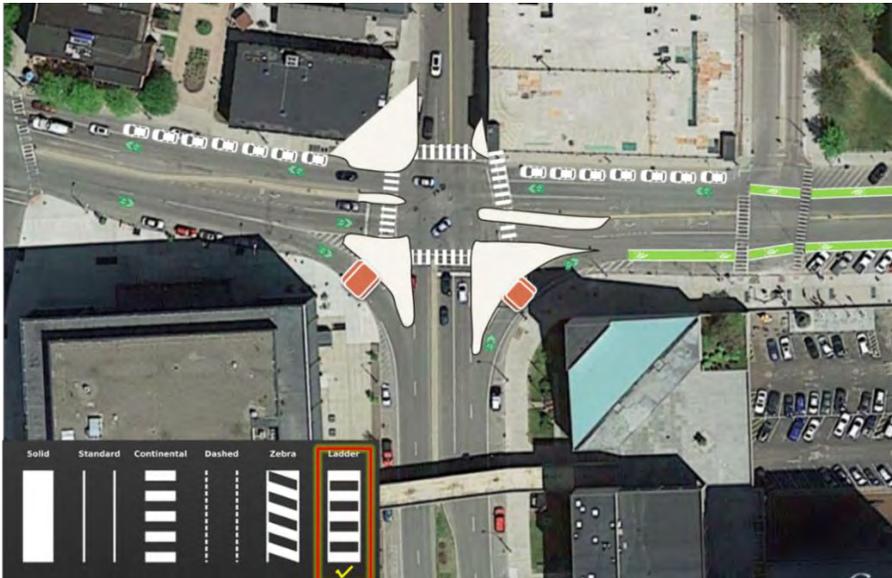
Concept: Intersection Redesign of Hawley Street and Washington Street
